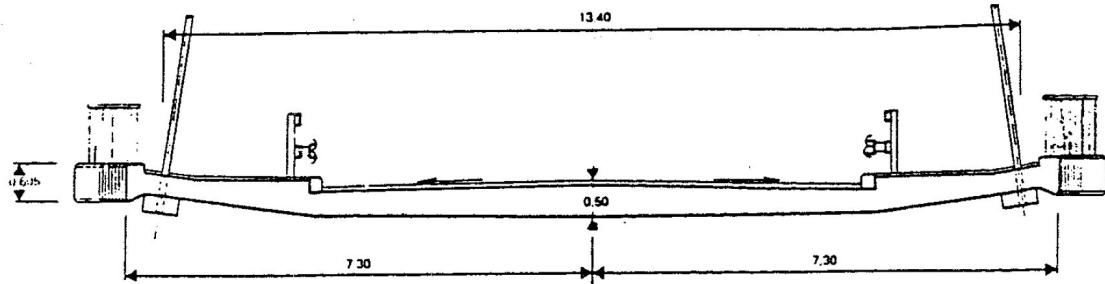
Concrete deck section of Dala river Bridge in Switzerland [2].
